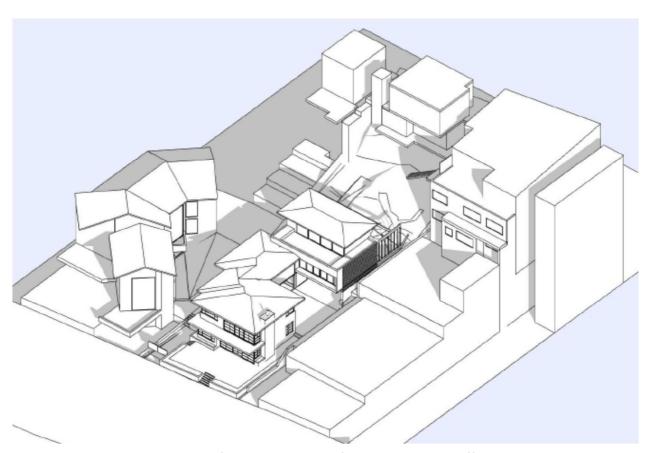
Axonometric diagram of the proposed built form and its walled effect to the useable backyard of 36 Beatty Street (source CHROFI DA-901 A)
